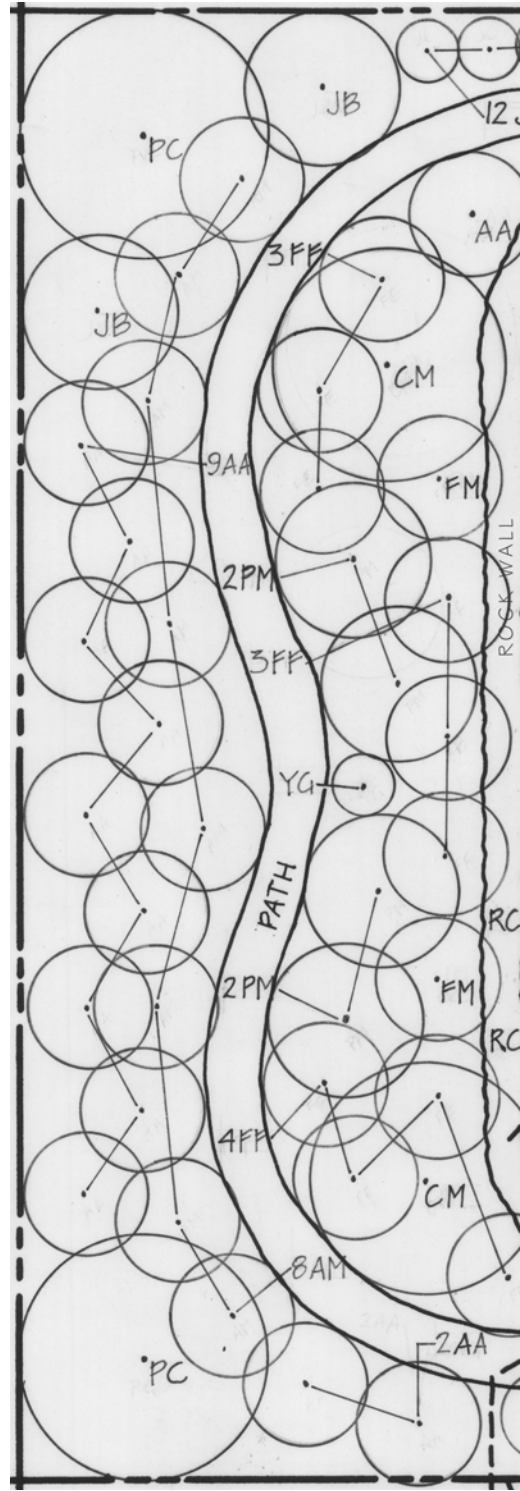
and 3.23 Deck Garden rendering and planting plan for the original design
